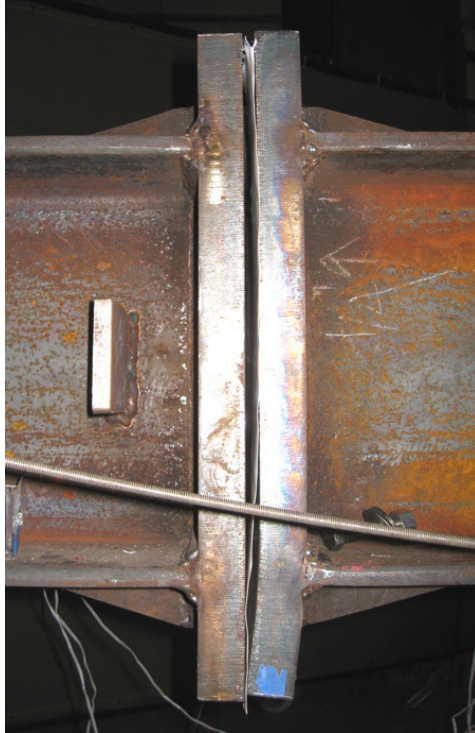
Bent flange plate after Test #4 (collar removed)
